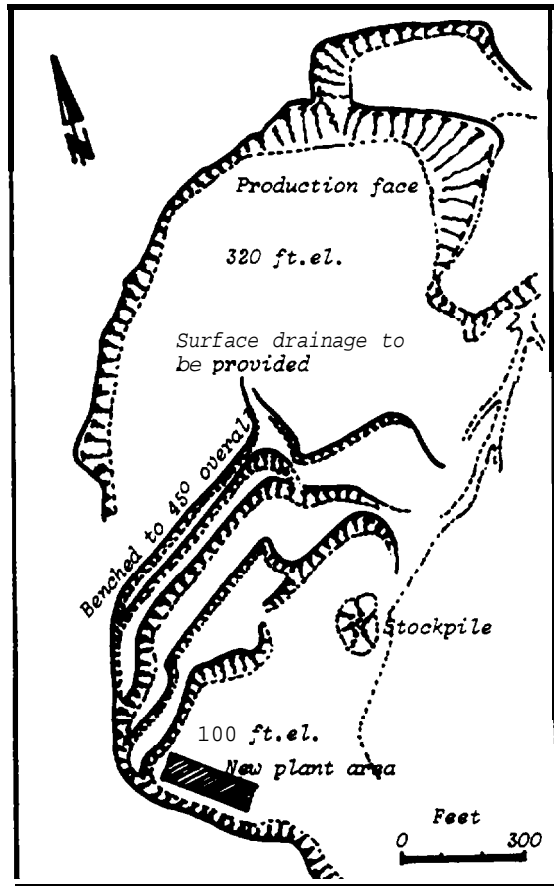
Plan of proposed benching of lower slopes in Batts Combe quarry. Slopes are to be benched back to an overall slope of 45° with pre-splitting of final faces. Surface drainage on upper quarry floor and provision of horizontal drain holes in bench faces if piezometers indicate high sub-surface water levels.
